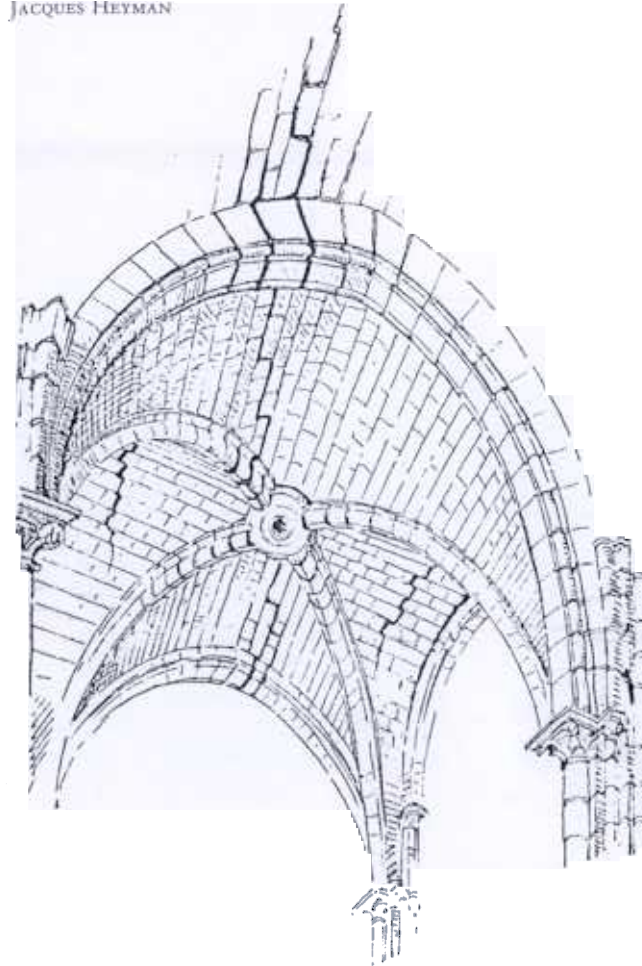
Typical cracks in Gothic vaults. Pol Abraham distinguished between the tensile cracks near the crown, the 'Sabouret cracks' parallel to the wall ribs, and the separation of the vault from the walls.
